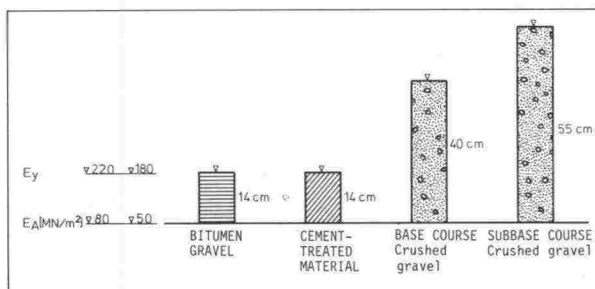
Correspondence of different pavement structure materials according to the instructions of Road and Waterways Administration /40/
